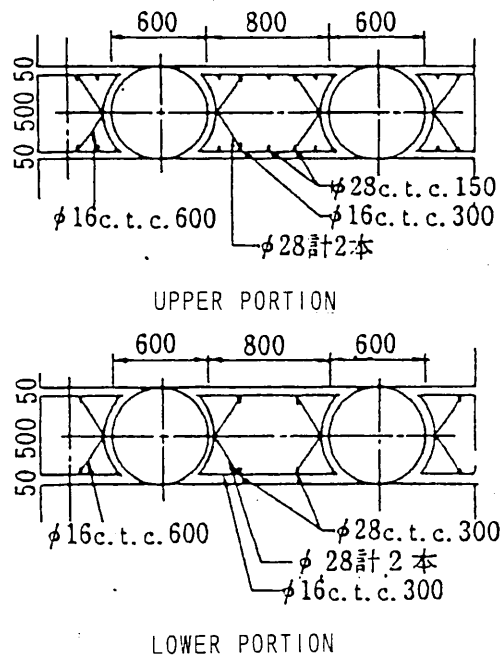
Shape and arrangement of ICOS wall elements (cylindrical pile and bi-focal panel). Panels are reinforced.
